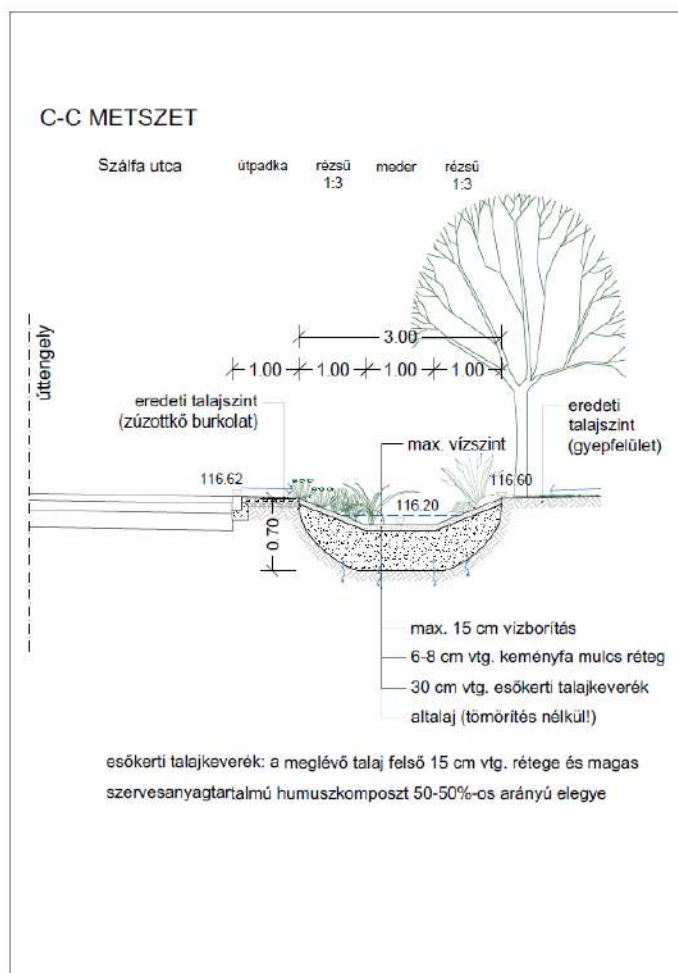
The location, type and layout of a section of Szálfa street
